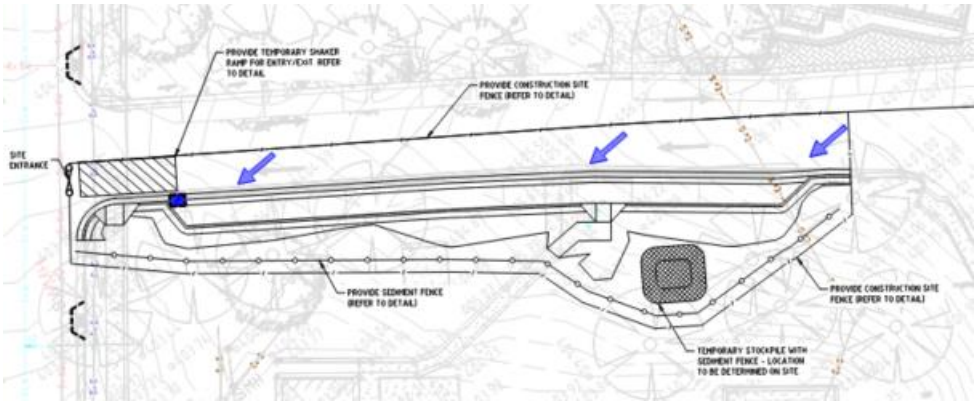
Southwest Carpark A (Road) Site Sediment and Erosion
